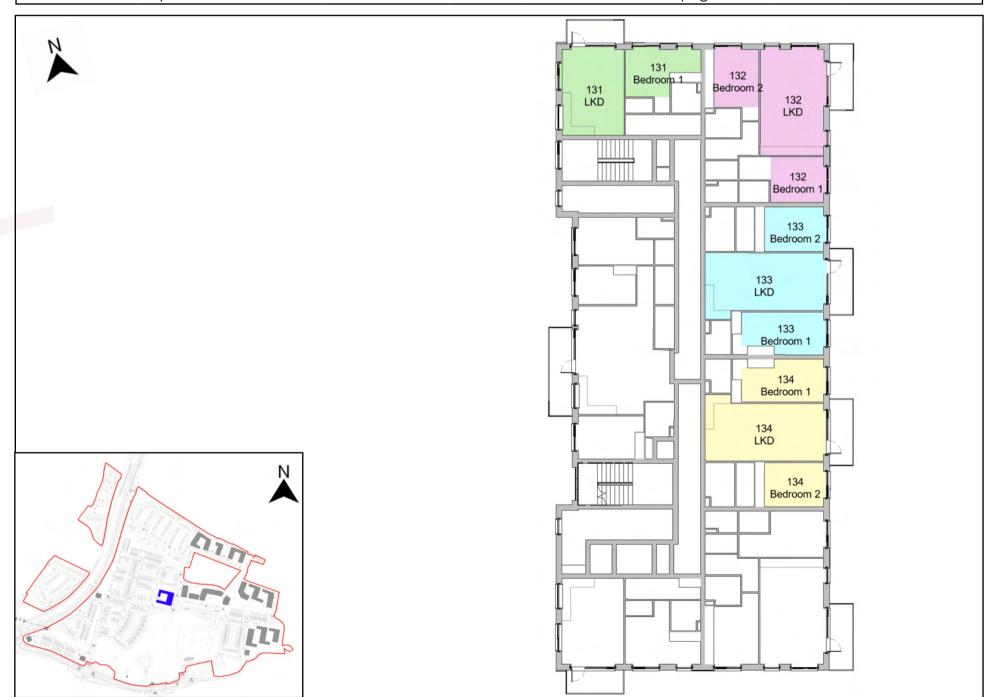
Floor plan of assessed building & Keyplan highlighting the assessed building.
